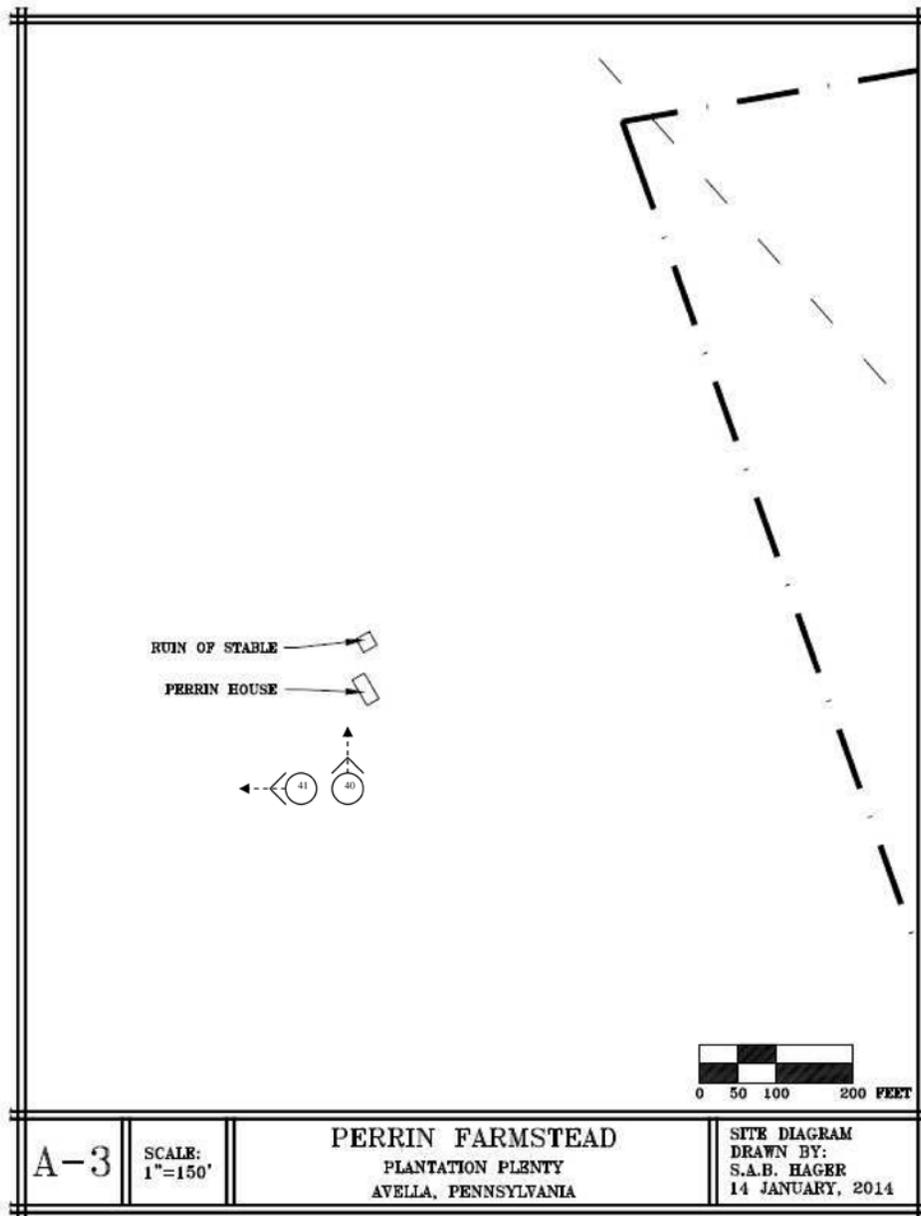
Plantation Plenty Perrin Farmstead Photo Key Plan
